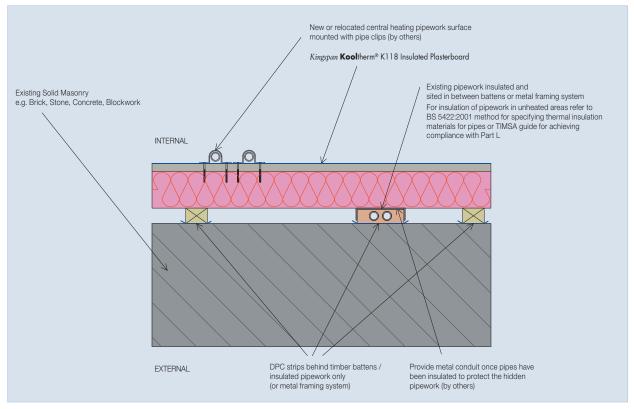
Central Heating Pipework on the Surface of Kingspan Kooltherm® K118 Insulated Plasterboard (Mechanically Fixed)
